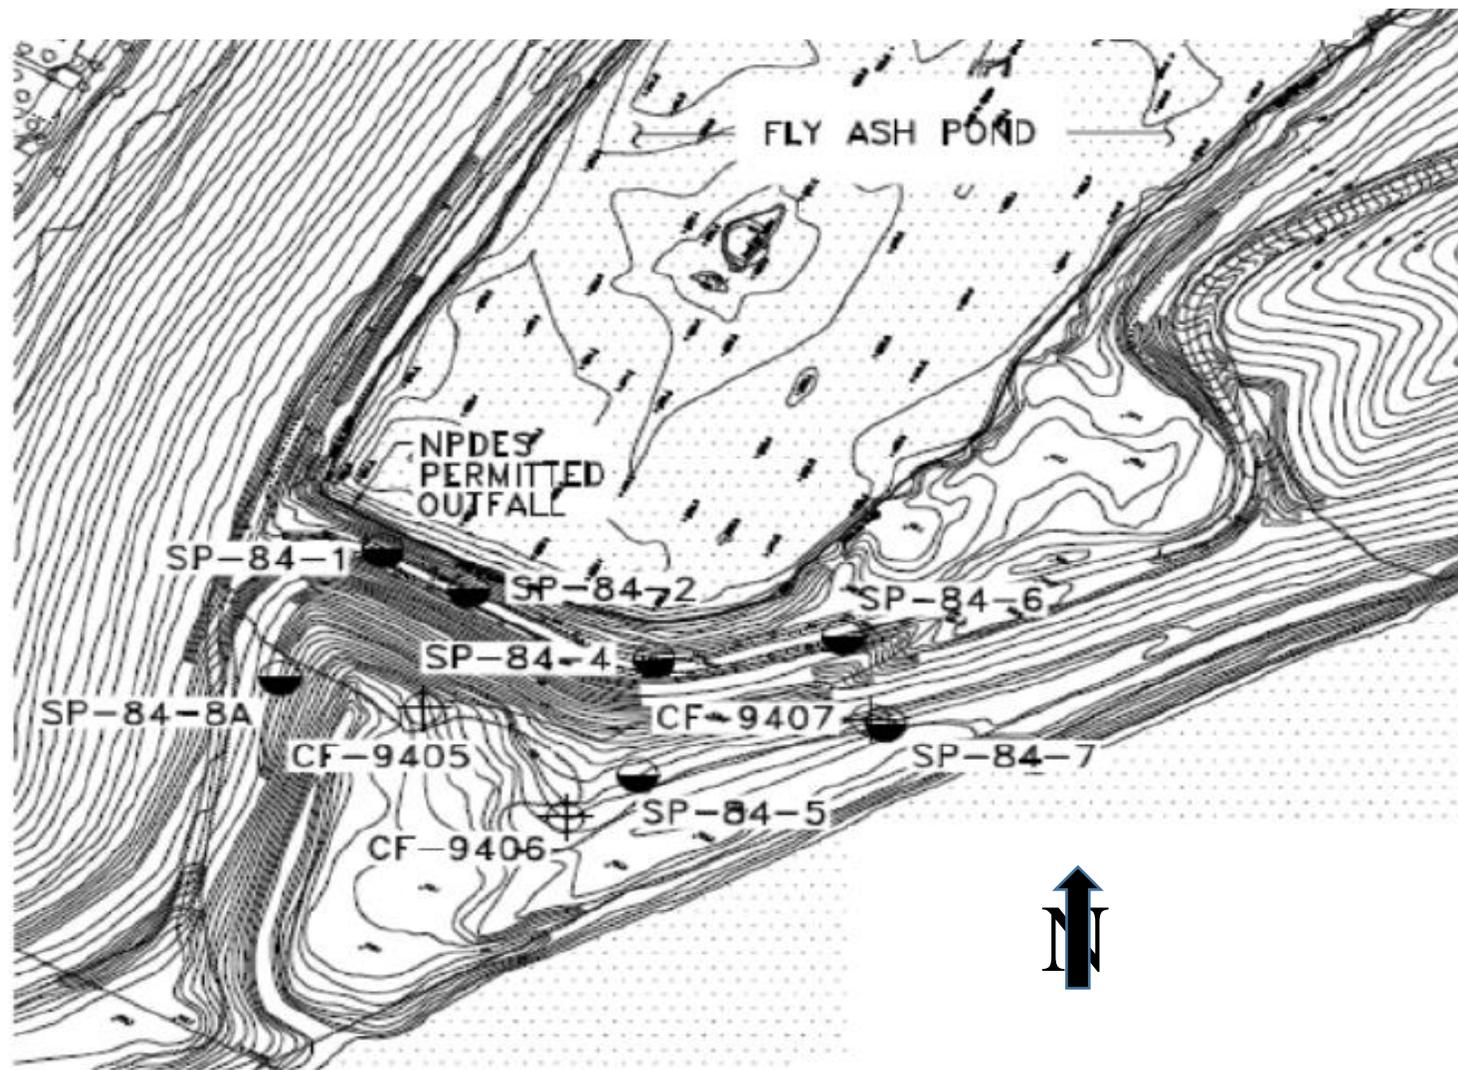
Landfill Runoff Collection Pond Piezometers Data.
